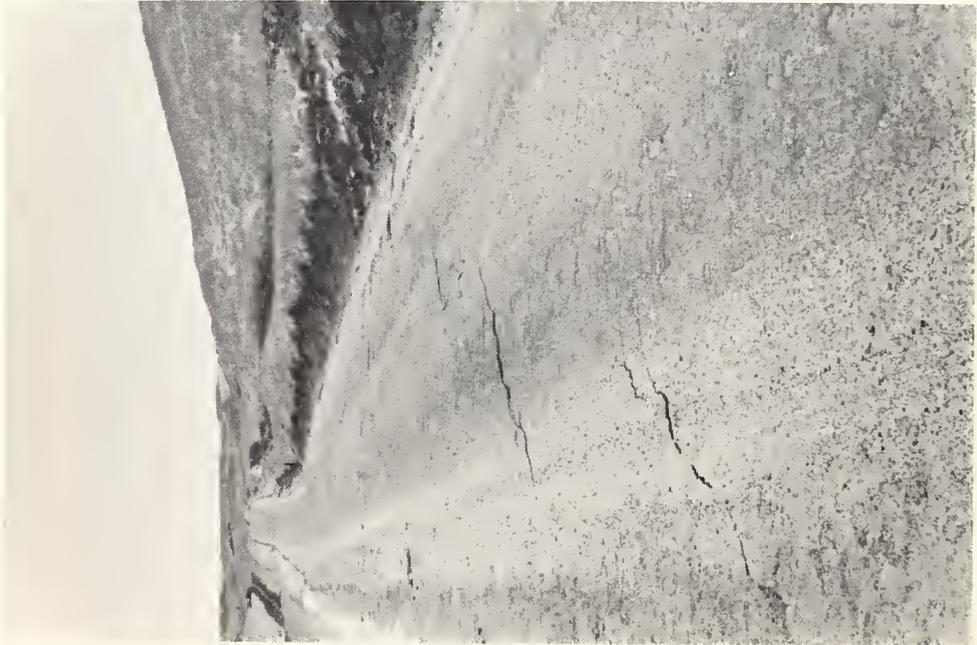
En échelon cracks across road about $\frac{1}{2}$ mile south of Strong-motion Station No. 2. View looking south. (Photo by Ed Etheredge)
